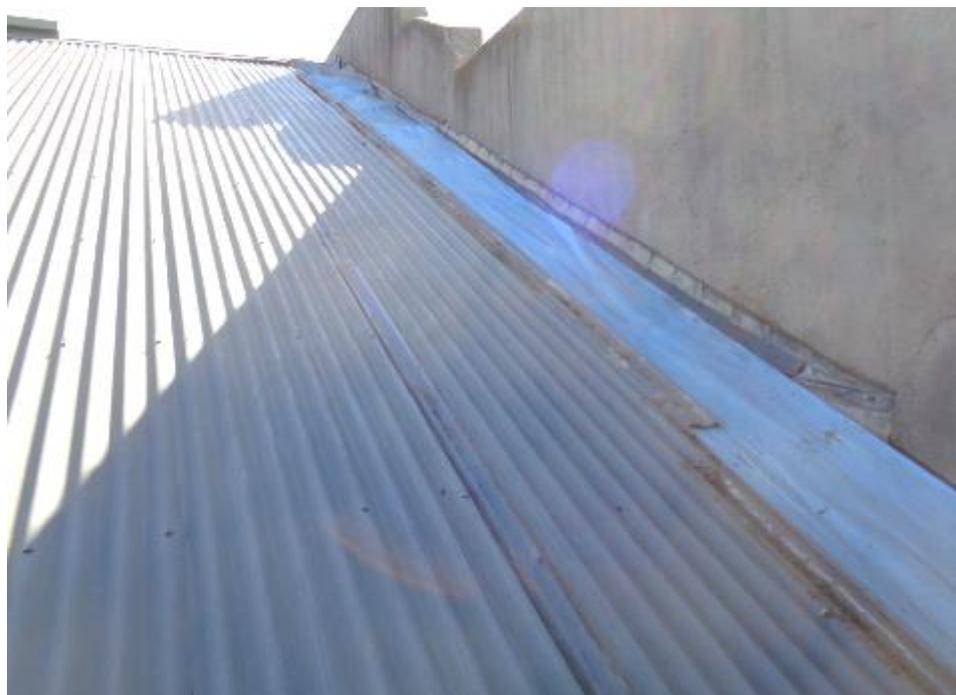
Example of roof sheeting over main hall showing spacing between fixings
